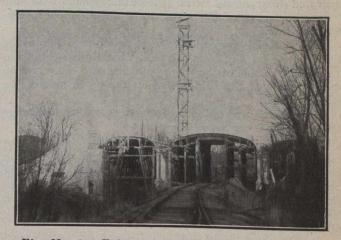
Falsework and Centering for Arched Superstructure
